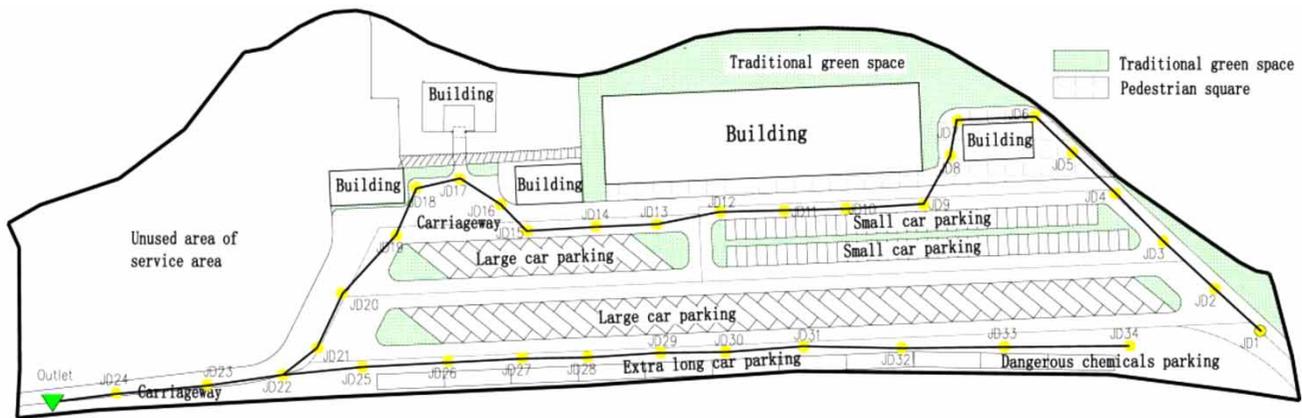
| Schematic diagram of Pu'er tunnel service area.
